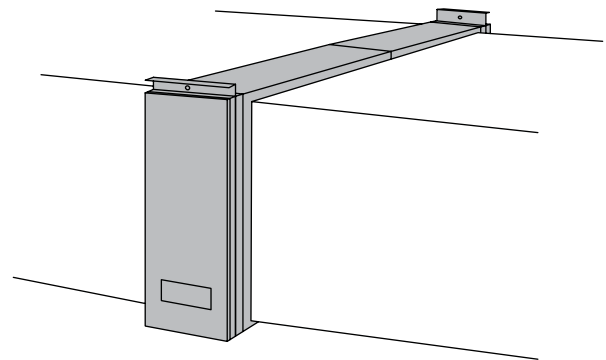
Counterflow furnace is installed with the Media Air Cleaner mounted horizontally in the return duct or plenum, positioned just above furnace.
